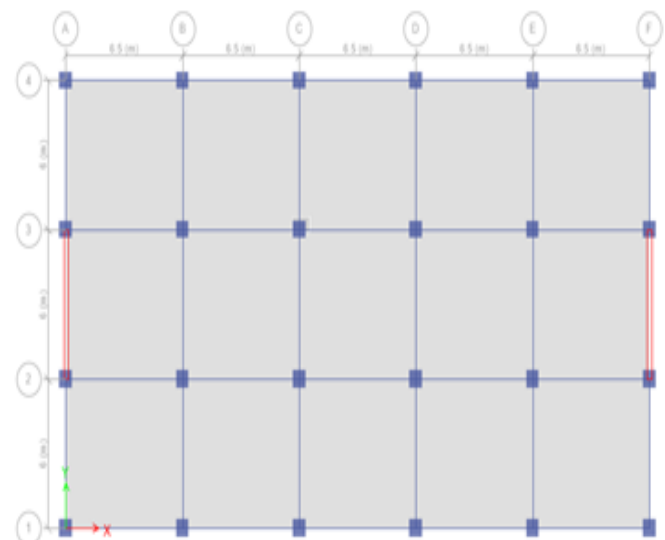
Model 2 – Floor plan of the dual system with shear wall on side of the structure.
